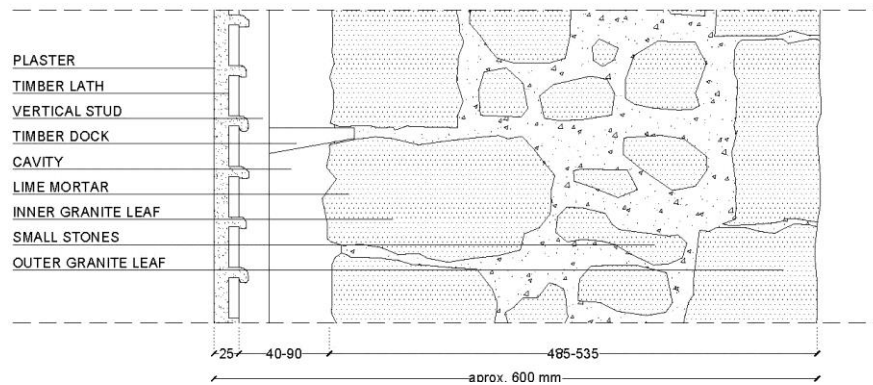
Solid wall section detail (Adapted from Buda, Taylor and Bennadji 2013).
